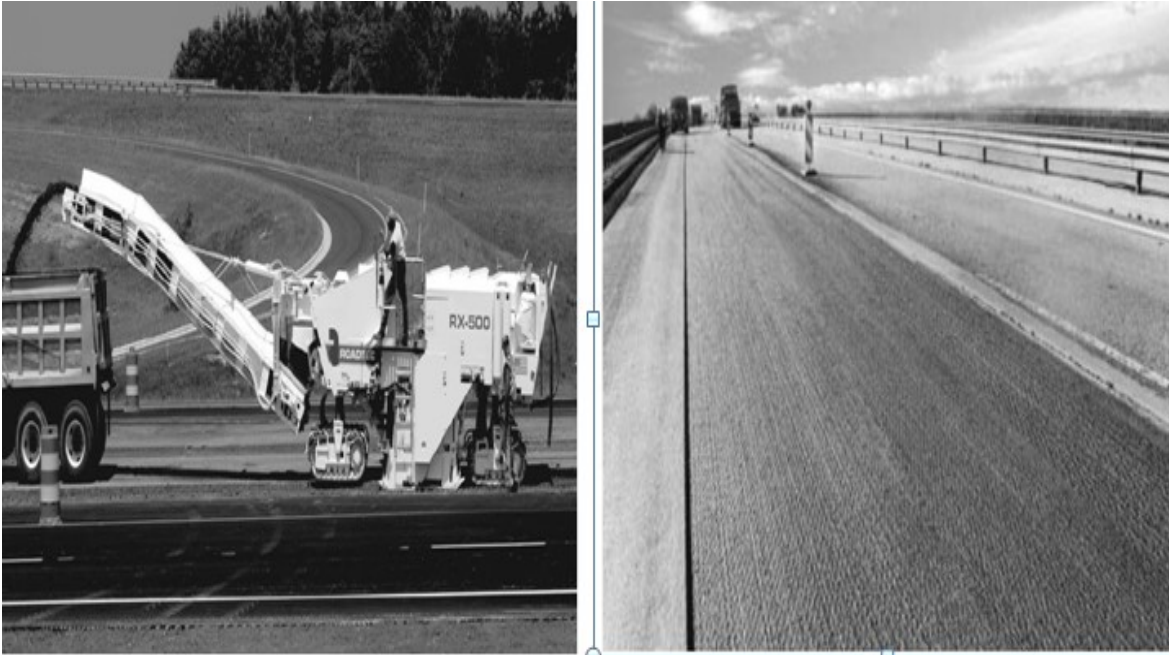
Typical front loading milling machine and milled pavement surface texture
